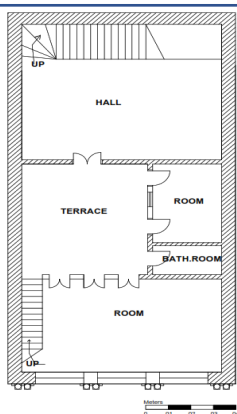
Second Floor Plan – Gurudwara Guru Singh Sabha
